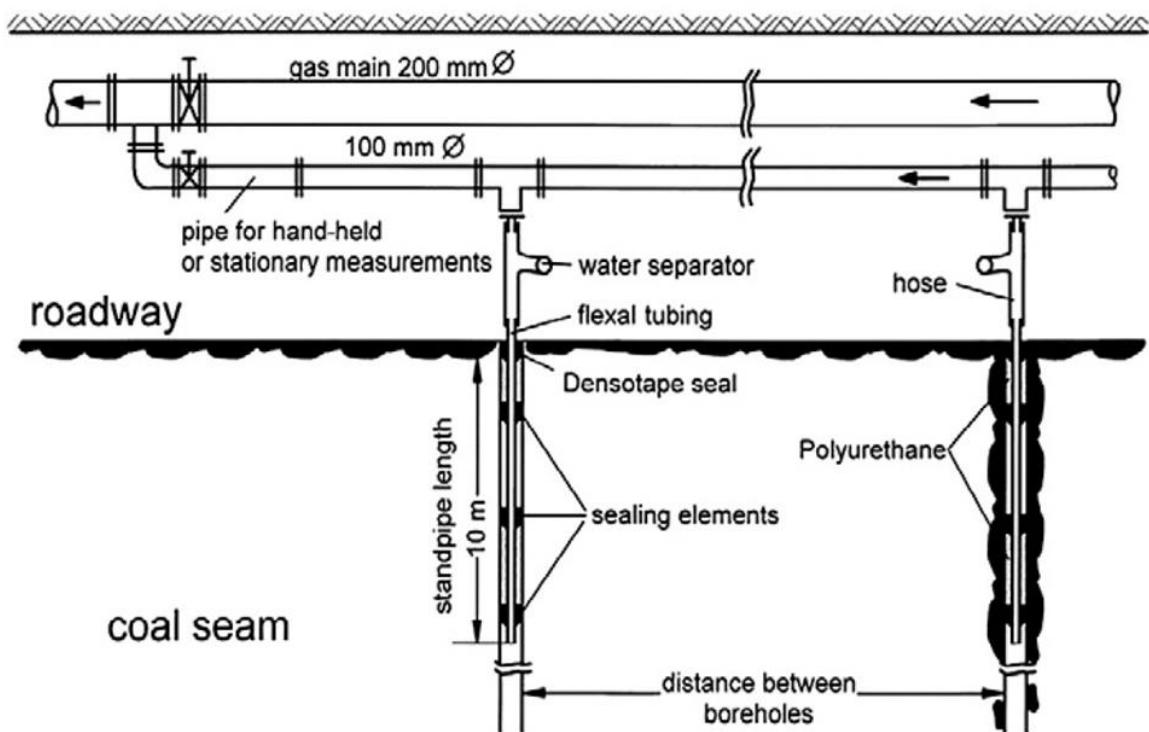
An underground connection schematic of pre-drainage boreholes (Noack, 1998).
